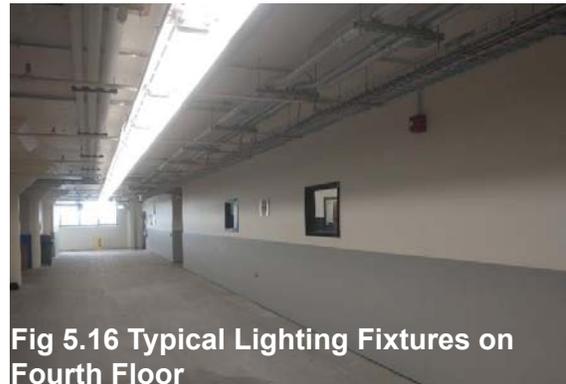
Typical Lighting Fixtures on Fourth Floor
